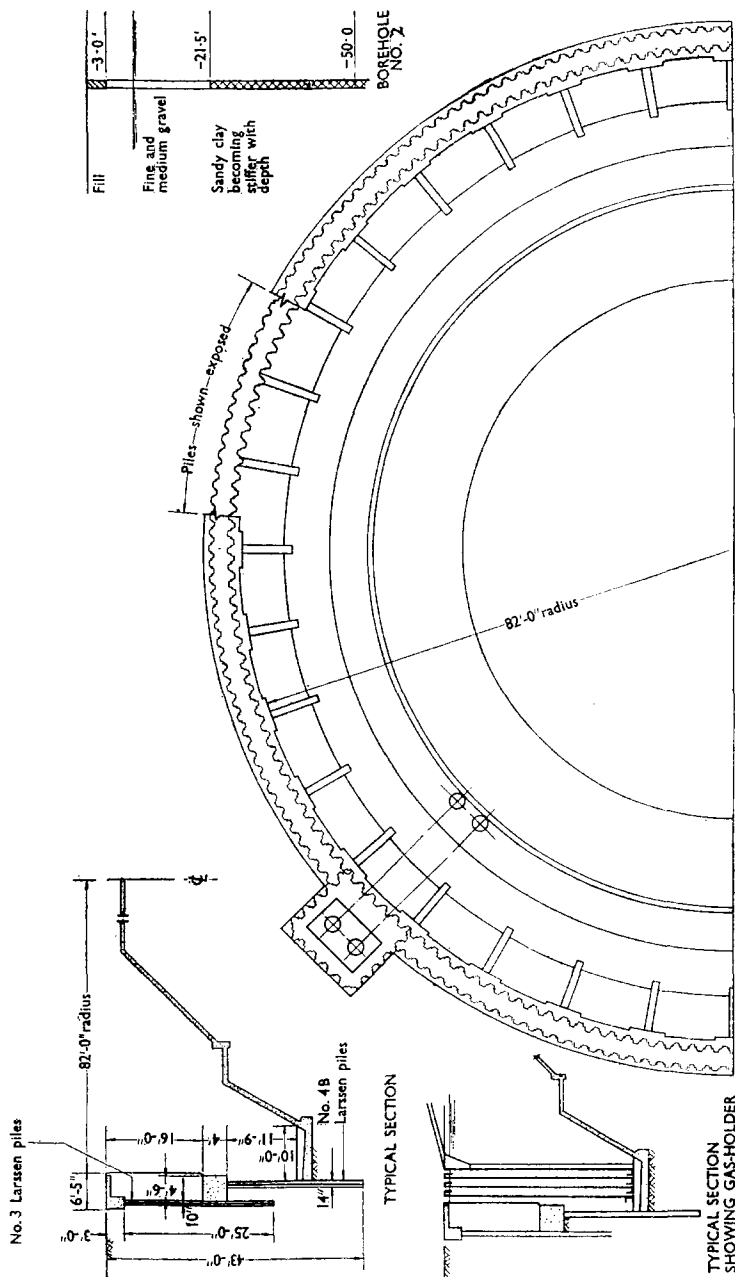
SHEET PILE TANK FOR 2.3 MILLION CU. FT GAS-HOLDER, KINGSTON-ON-THAMES
